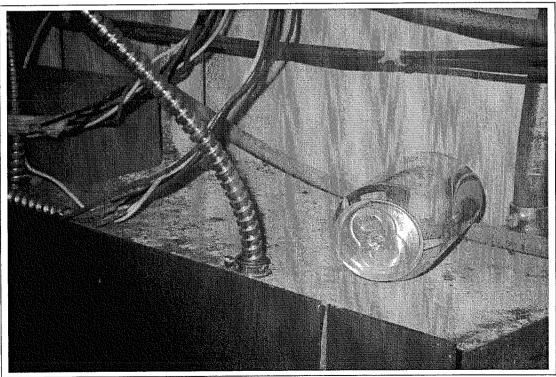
Location of Dust Sample #1 (top of electrical panel – beneath sprayed fireproofing) in the East wing, 2nd floor Telephone Closet
